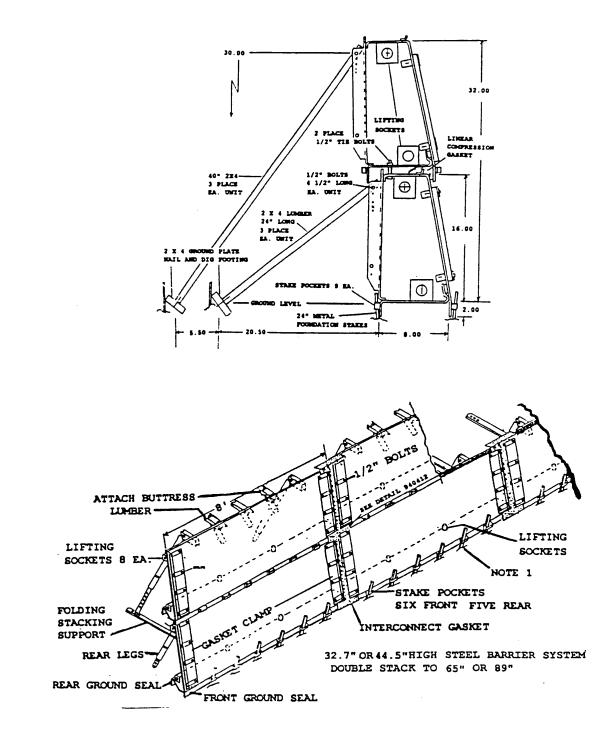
RICHARDSON'S STEEL FLOOD BARRIER
